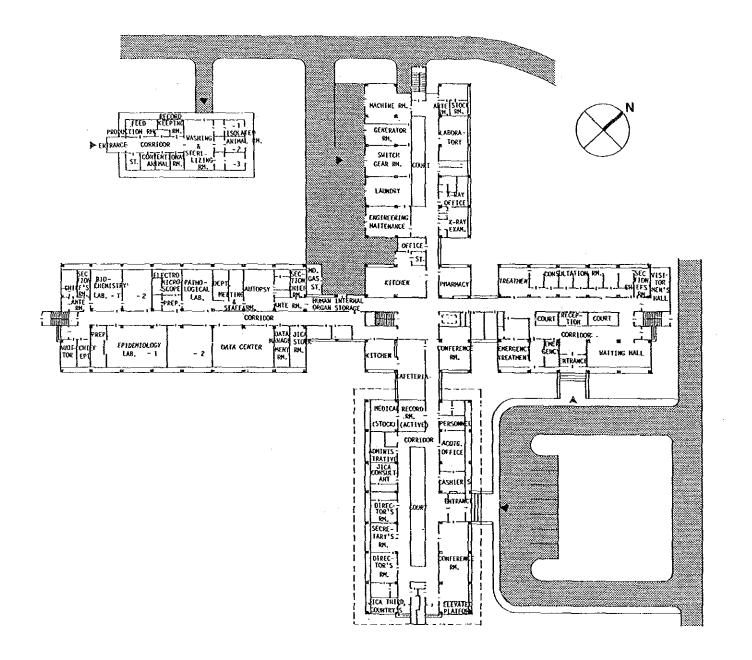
RITM EXISTING BUILDING 1ST FLOOR PLAN
